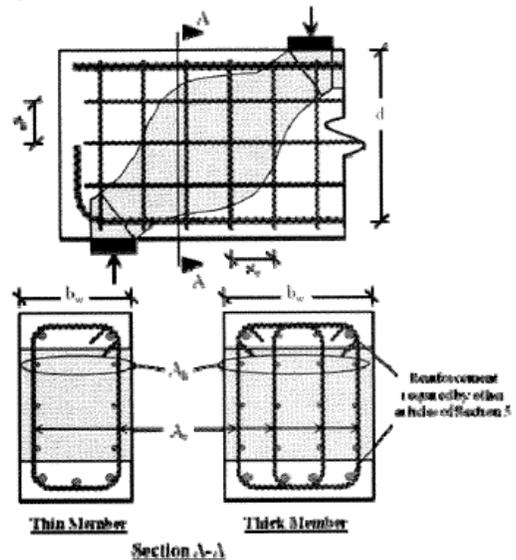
Distribution of Crack Control Reinforcement in Compression Strut
